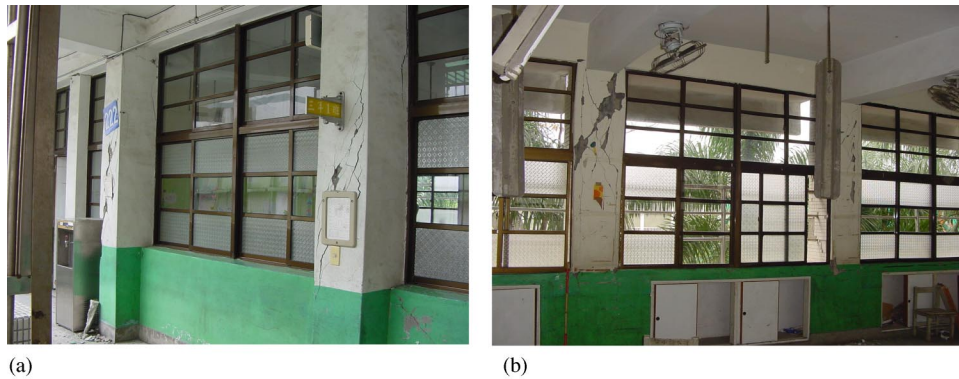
(a) Columns were damaged along the direction of the corridor; and (b) diagonal shear cracks were due to the short column effect, and the lighting facility had fallen down.
